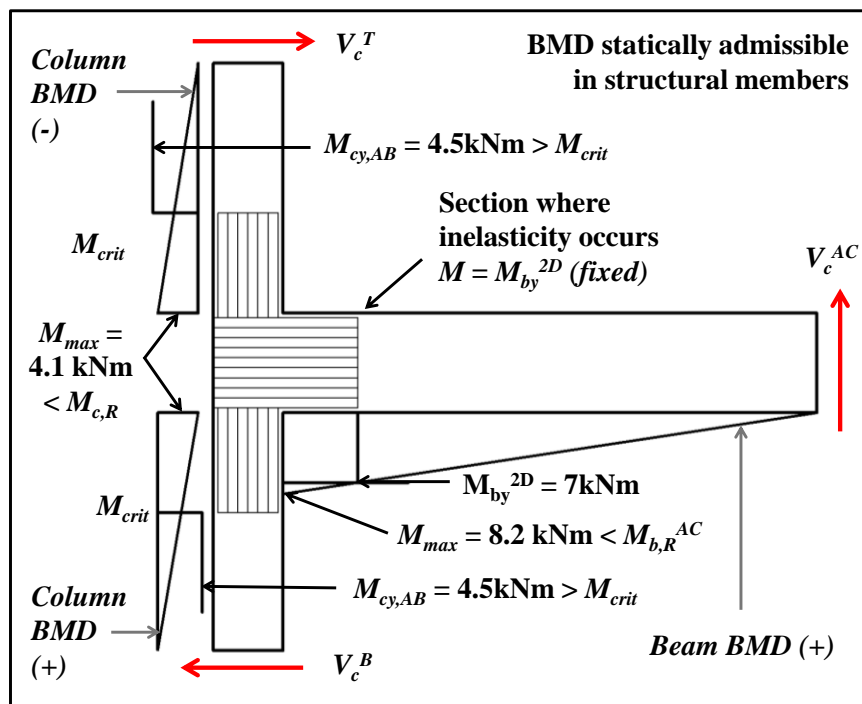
Statically admissible BMD of the collapse mechanism, long span beam column joints.
